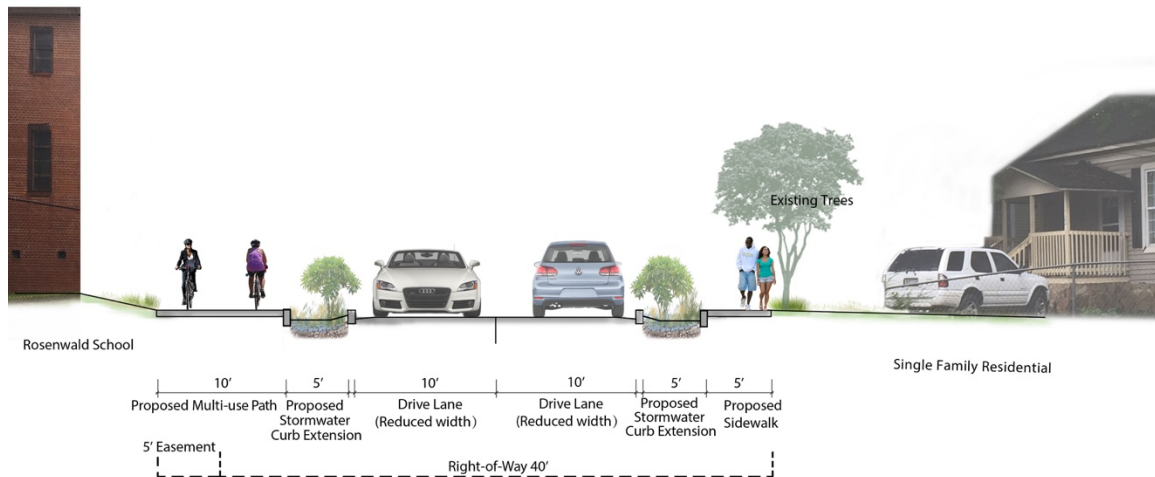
Section E-E – Proposed Street Cross Section (By author)
